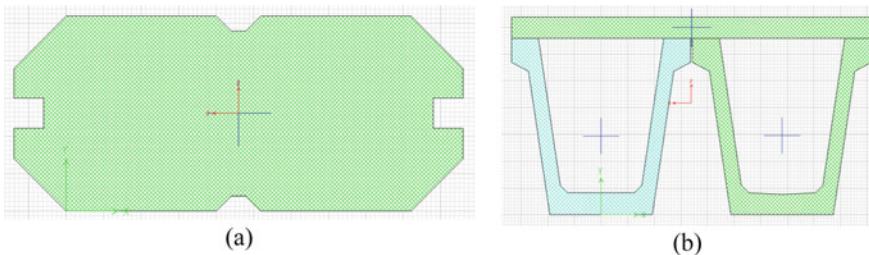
SAP2000 model: pier a and deck b cross section
